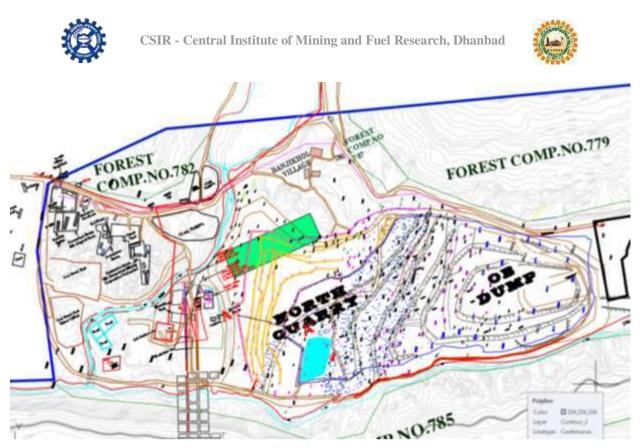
Position of section A-A' in existing pit of north quarry of Gare Palma IV/4
